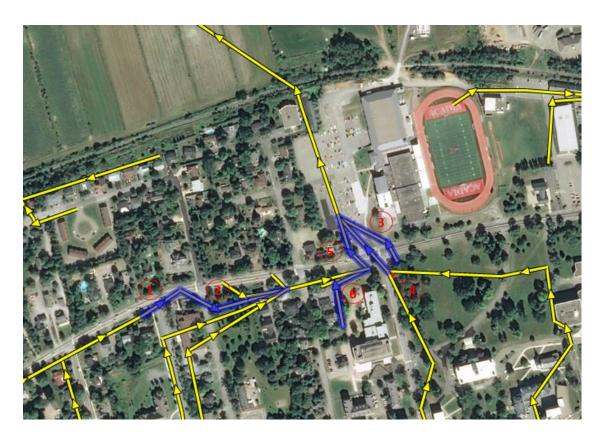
Proposed Upgrades for Stormwater Pipes near University Avenue and Main Street
